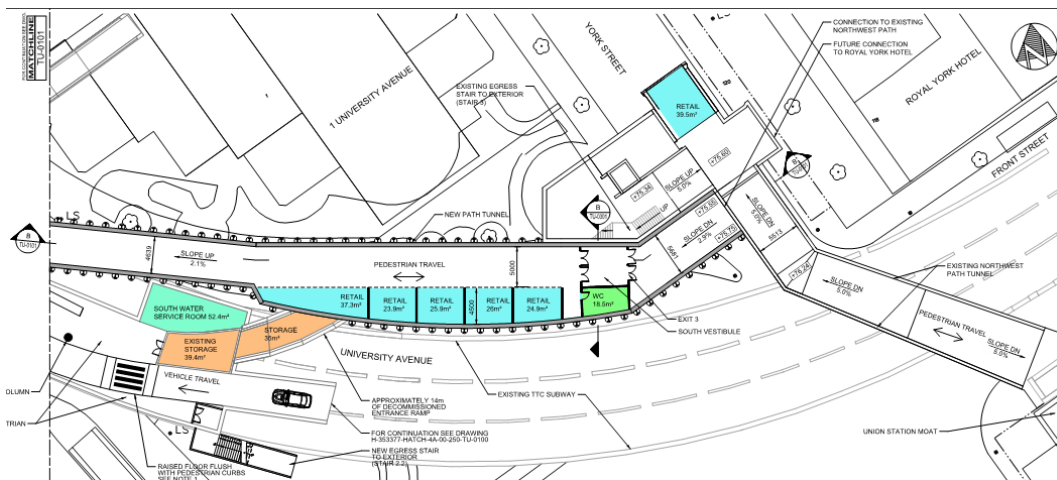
Plan view of the south section of the new NW PATH tunnel, connecting to Phase 1. Drawing courtesy of Hatch.
